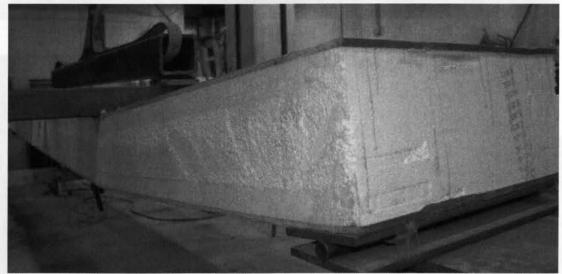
View of panel S-5 after failure showing deflected shape and OSB top facing crushing at the quarter point load location
